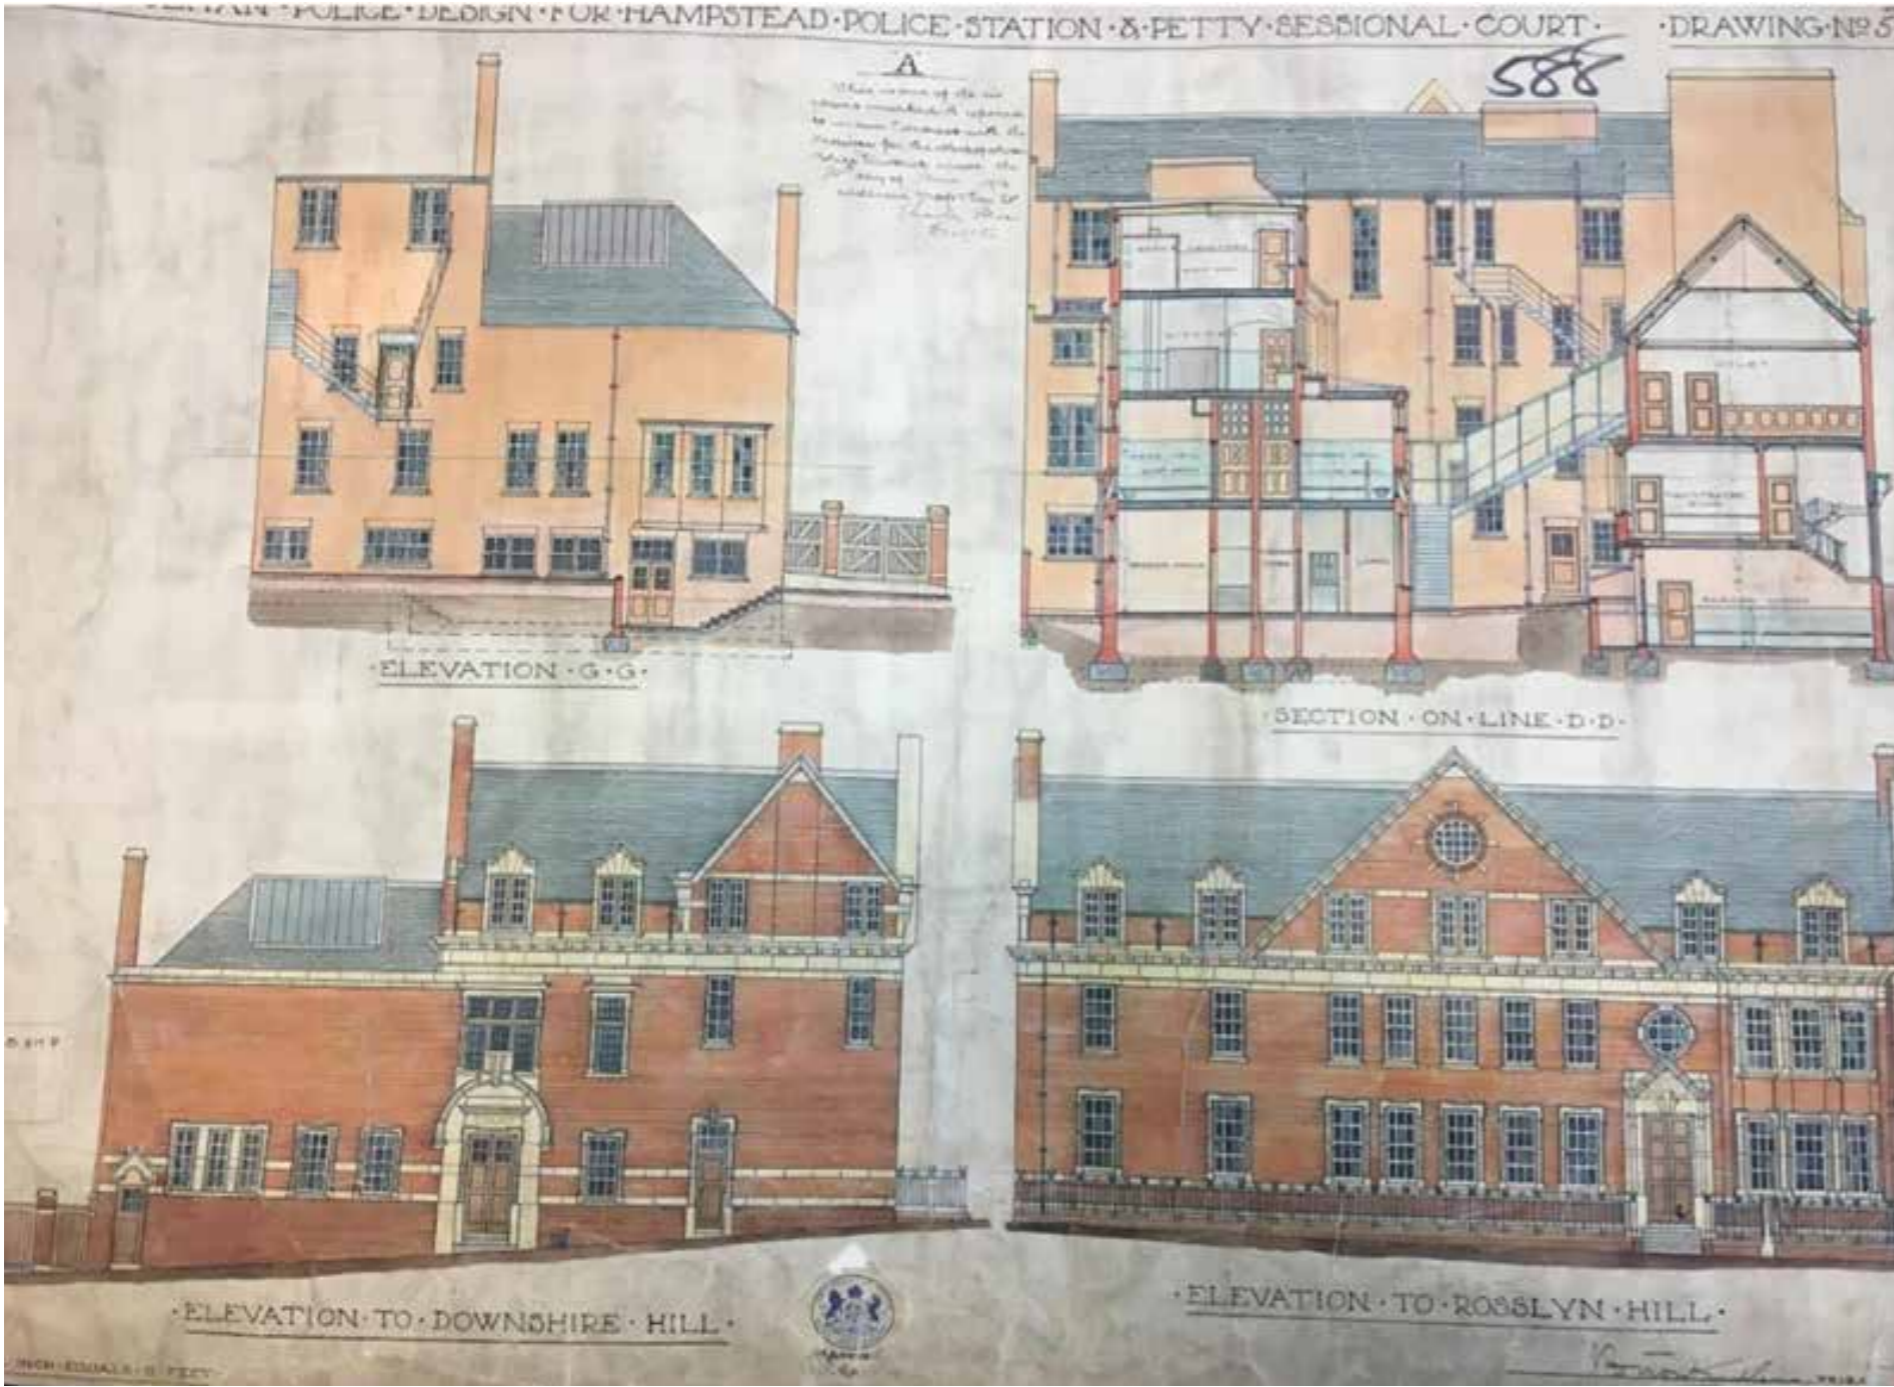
Original Elevations and Section, John Dixon Butler. Source: Metropolitan Police Archive
